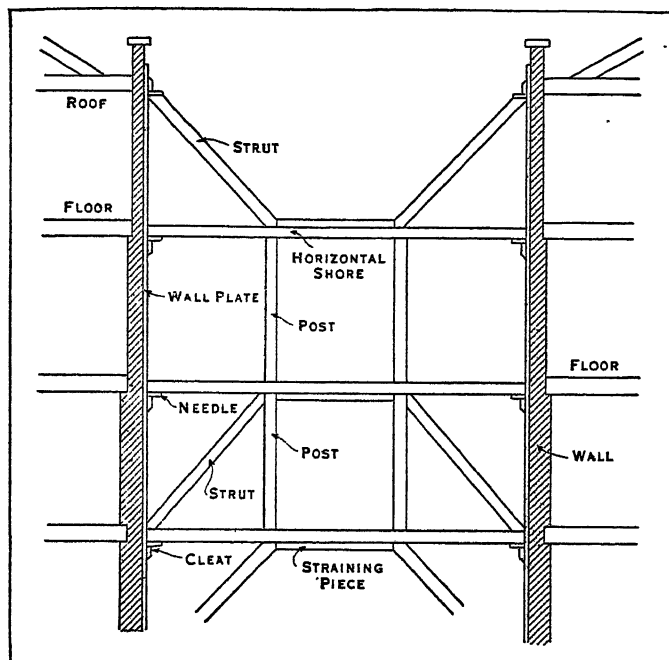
SYSTEM OF FLYING SHORES USED IN CONSTRUCTING A HIGH BUILDING
